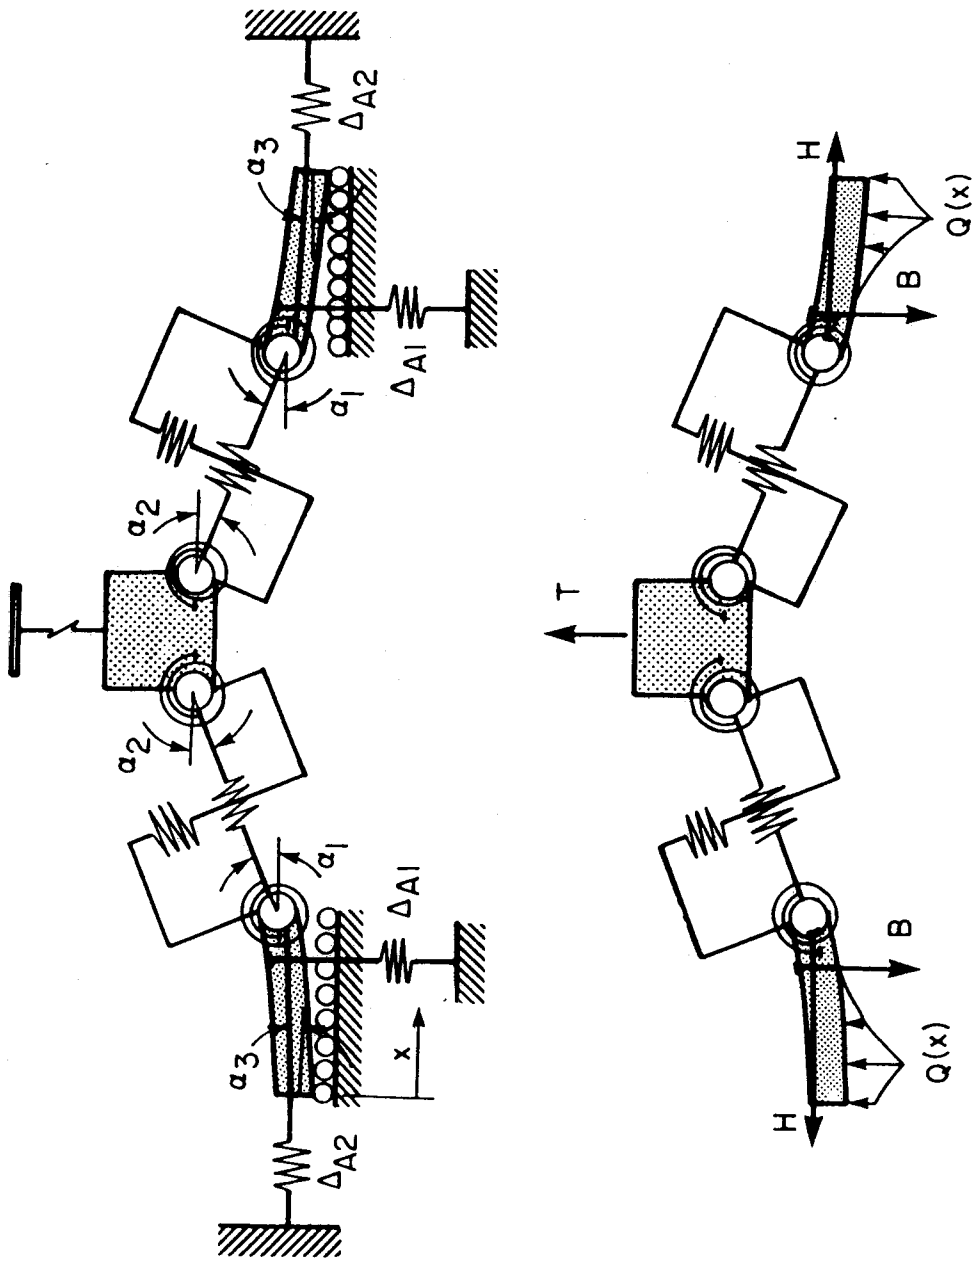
Model of Flexible End Plate Connection In Deformed Position
